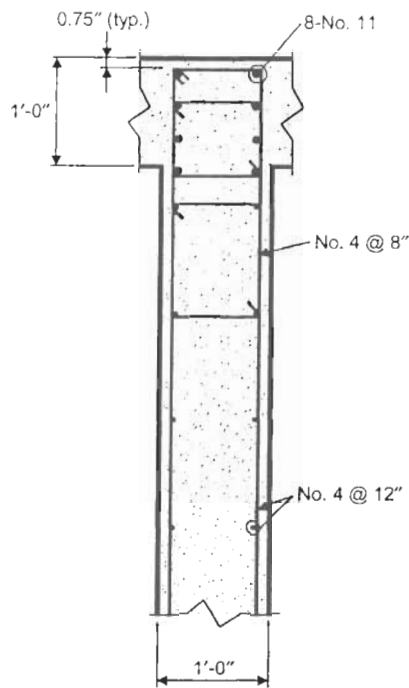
Reinforcement Details for Shear Wall Along Line 4 (SDC D)
